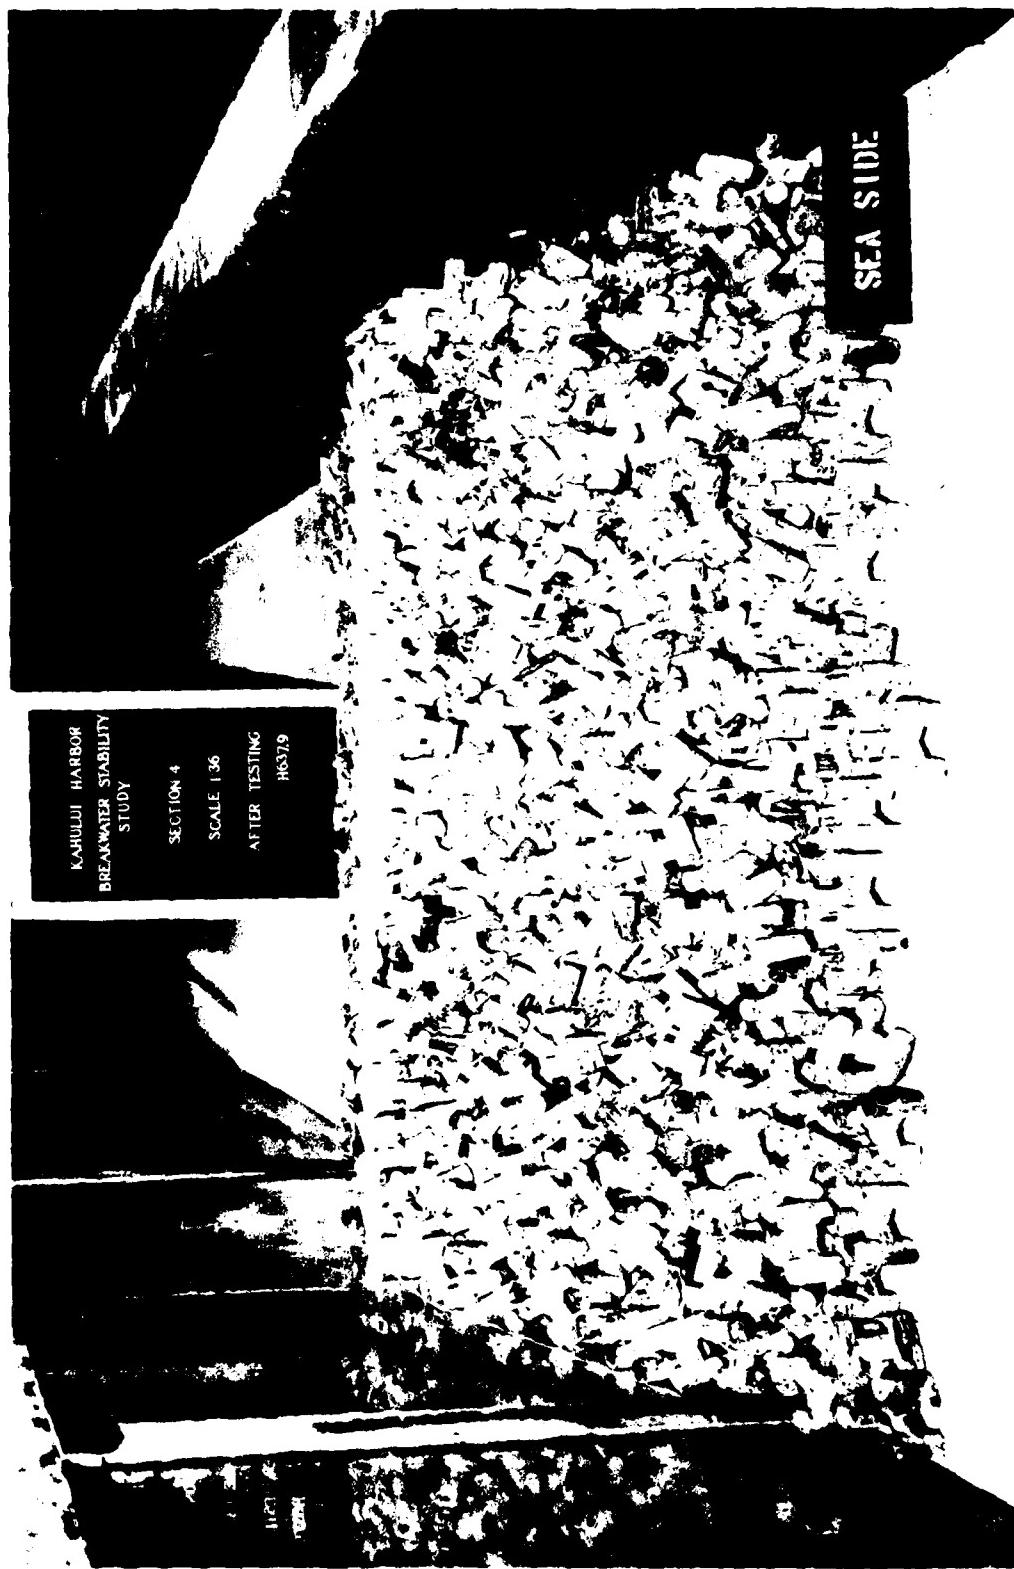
Sea-side view of Plan 1 after testing, 2nd test
